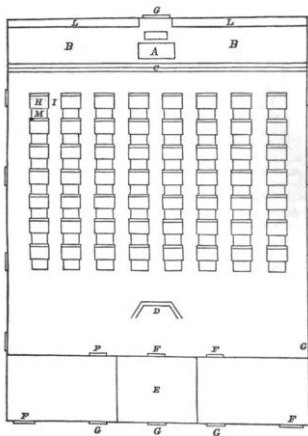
One Room School House Plan, 1938, Photo Credits: Weisser, A., (2006)
